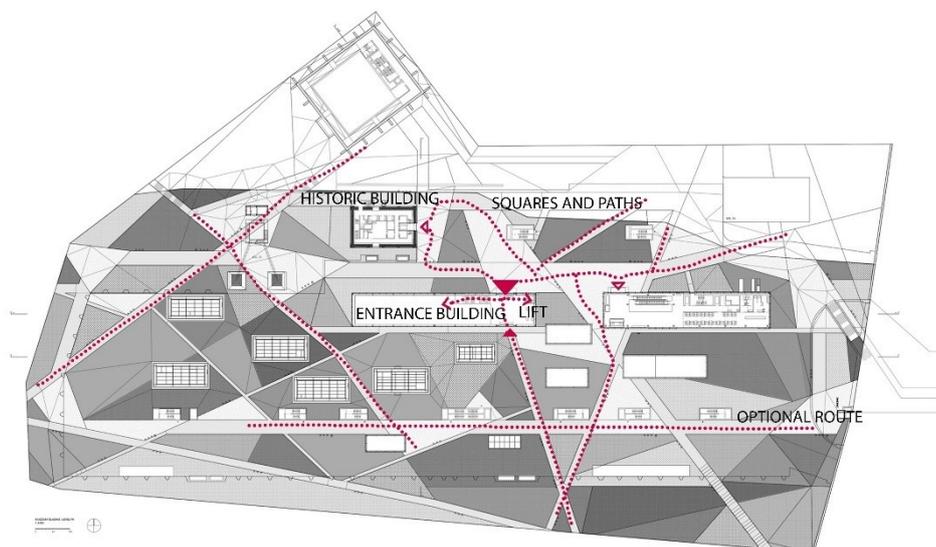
Silesian Museum in Katowice, Poland: Ground floor. (Source: Floor plan by Riegler Riewe Architekten with markings by Filová, 2021)
